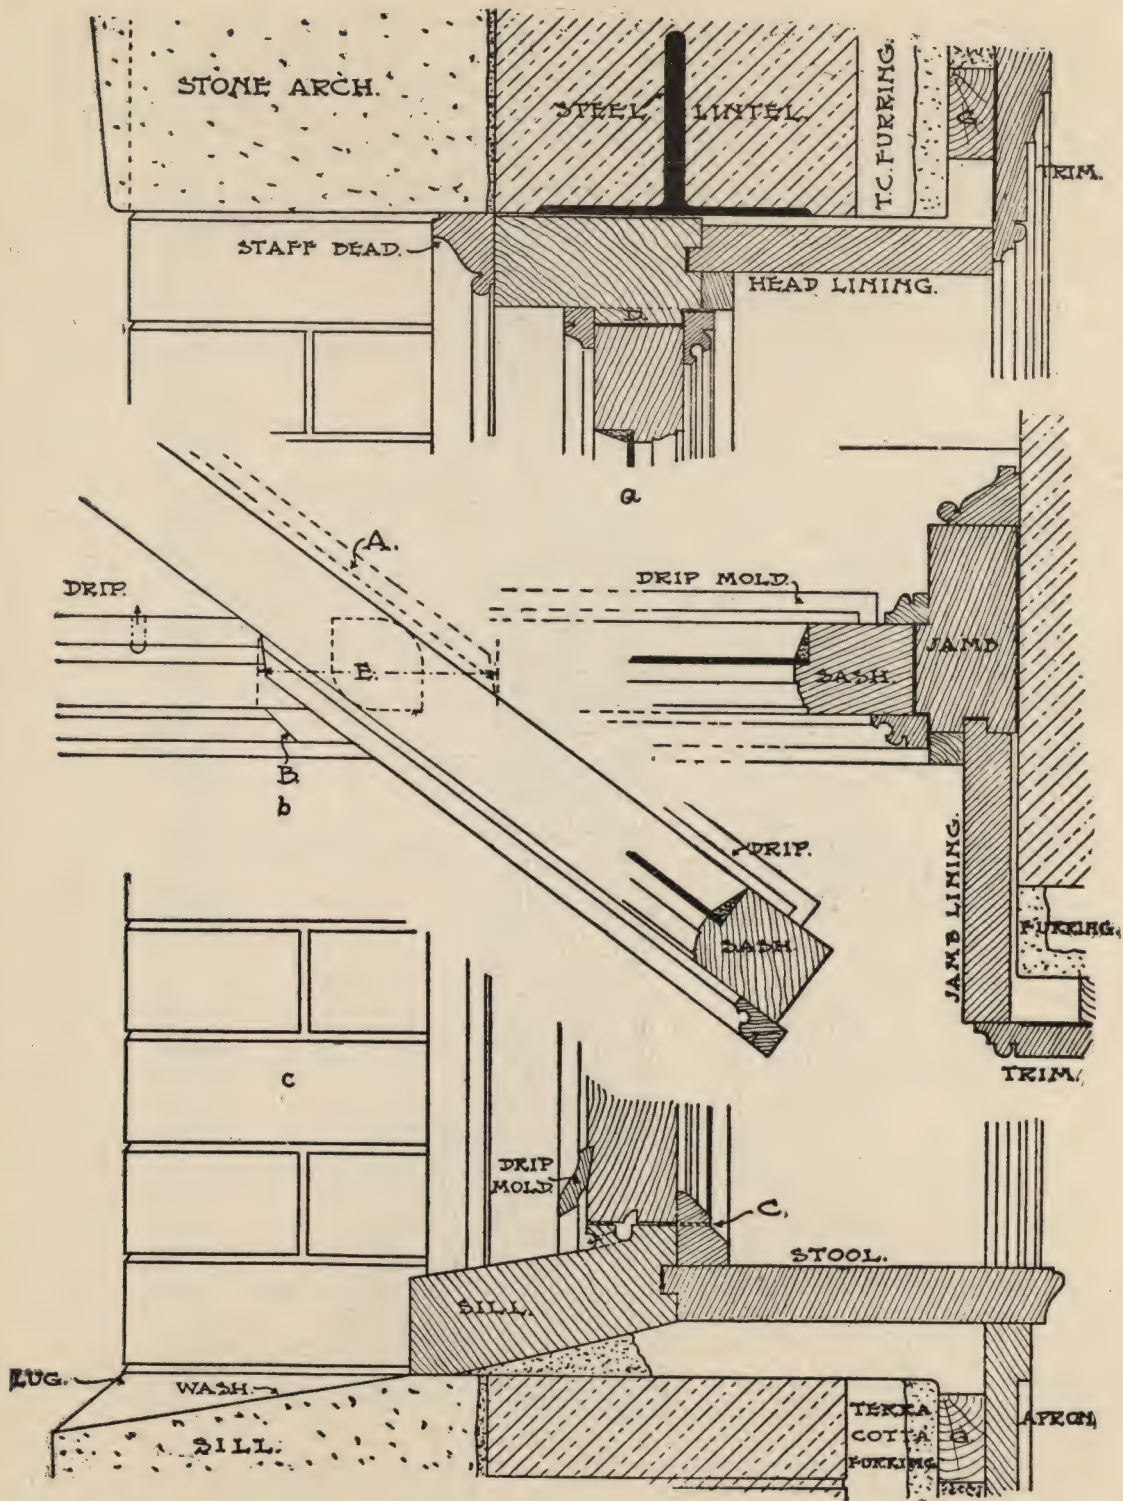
VERTICALLY PIVOTED CASEMENT WINDOW. CONSTRUCTION IN 16-INCH BRICK WALL.
